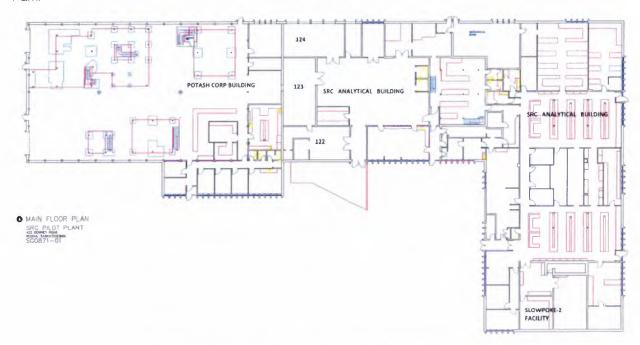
Floor Plan -- Potash Corp and SRC Analytical Source: SRC
